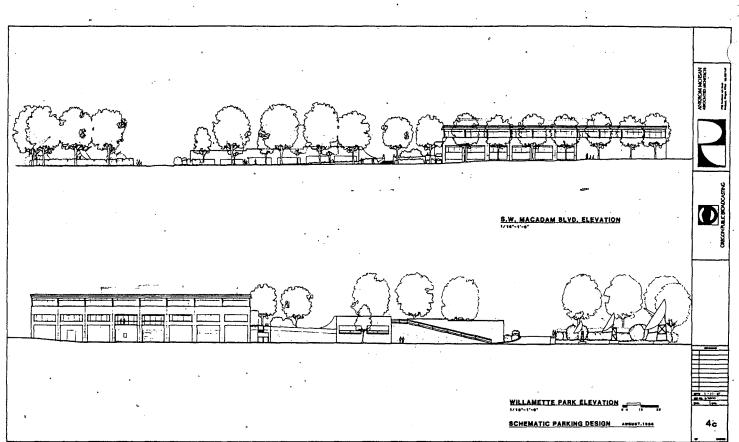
EXHIBIT: Plan proposed by Applicant, resulting in lowered parking structure, which requires variance.
